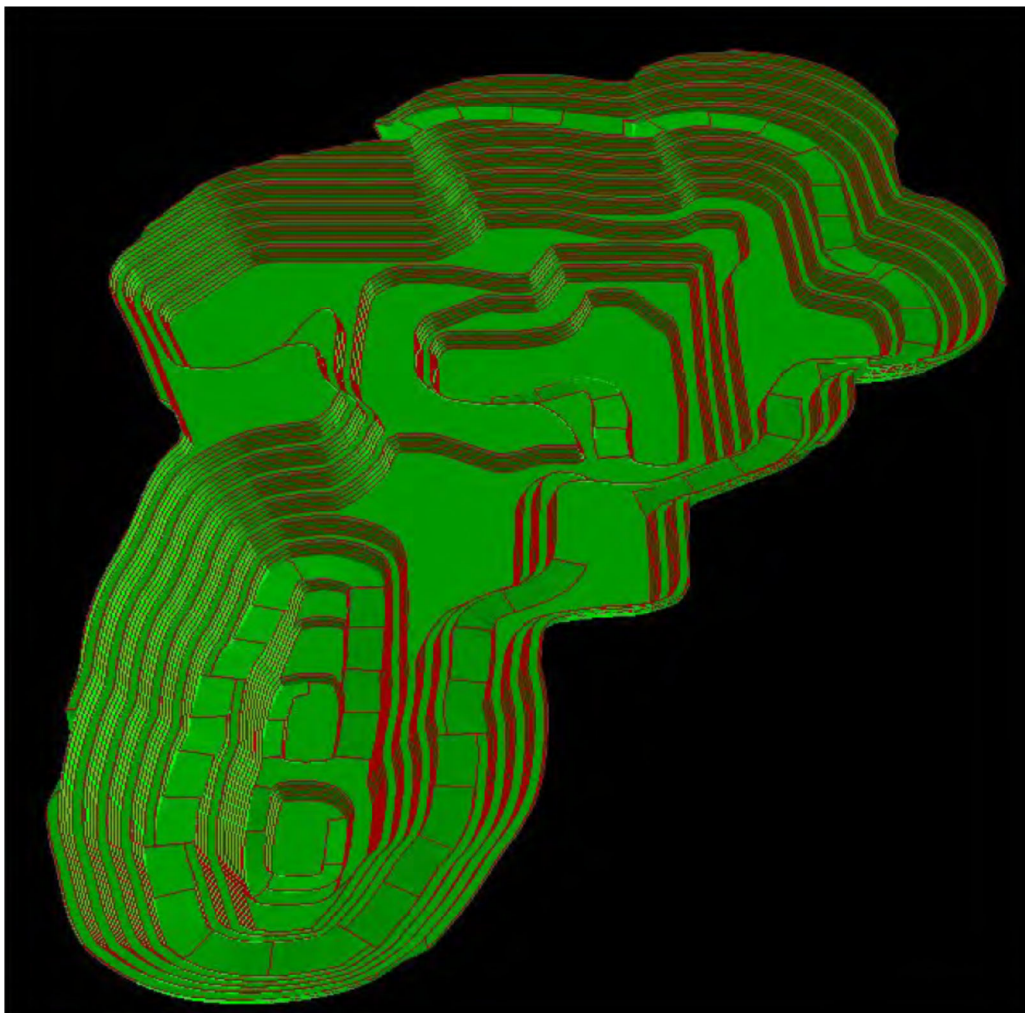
Spur-Dalcoath - Detailed 3D Pit Design. (View looking North)
